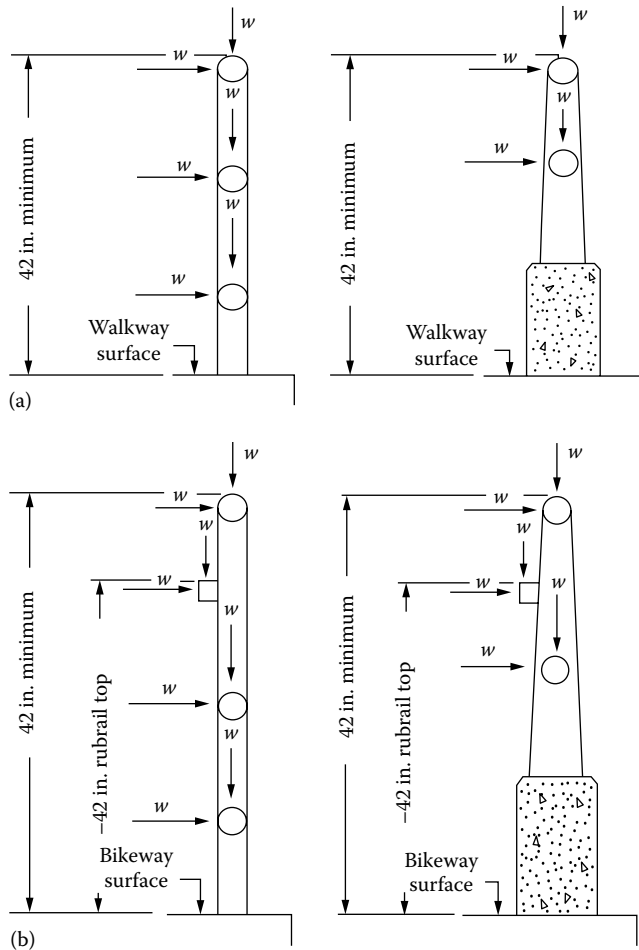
Loads on railing systems for pedestrian and bicycle bridges. Refer to LRFD Art. 13.8 and 13.9 for details. (a) Pedestrian railing loads. (b) Bicycle railing loads. (From *AASHTO LRFD Bridge Design Specifications*, Copyright © 2012 by American Association of State Highway and Transportation Officials, Washington, DC. Used by permission.)
